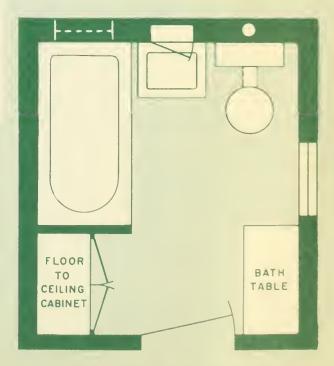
Bathroom 7 by 8 feet has plenty of space for dressing and for baby bath table.
